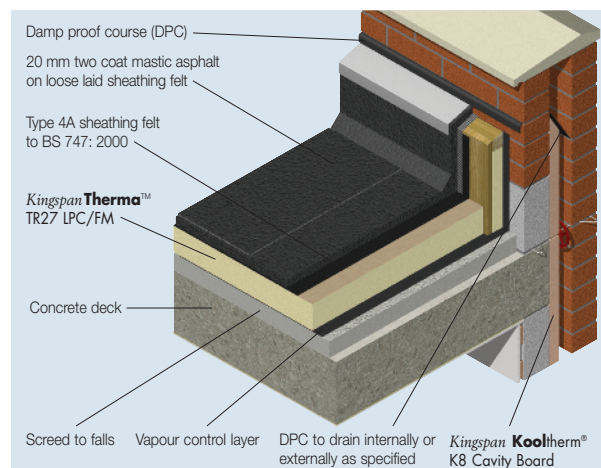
Dense Concrete Deck With Suspended Ceiling – Mastic Asphalt Waterproofing
